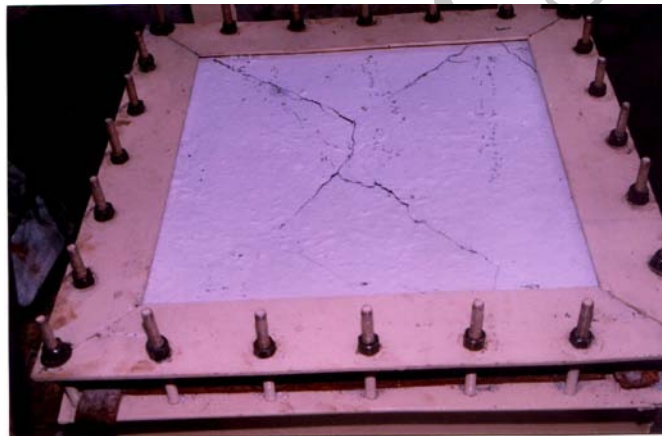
Failed specimen depicting crack pattern of PCC-0 slab
